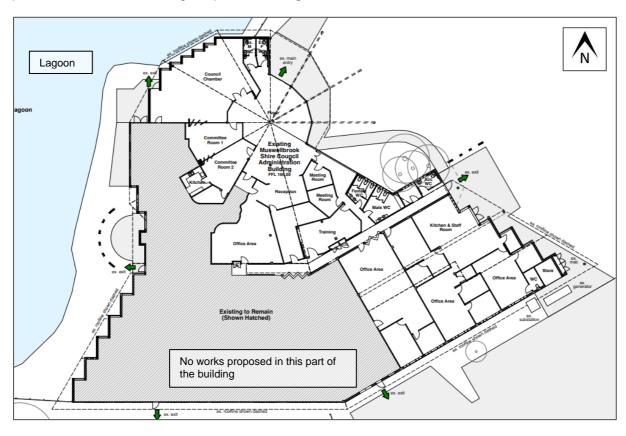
| Existing floor plan of the existing Council building (Source: Applicant's RTS)
